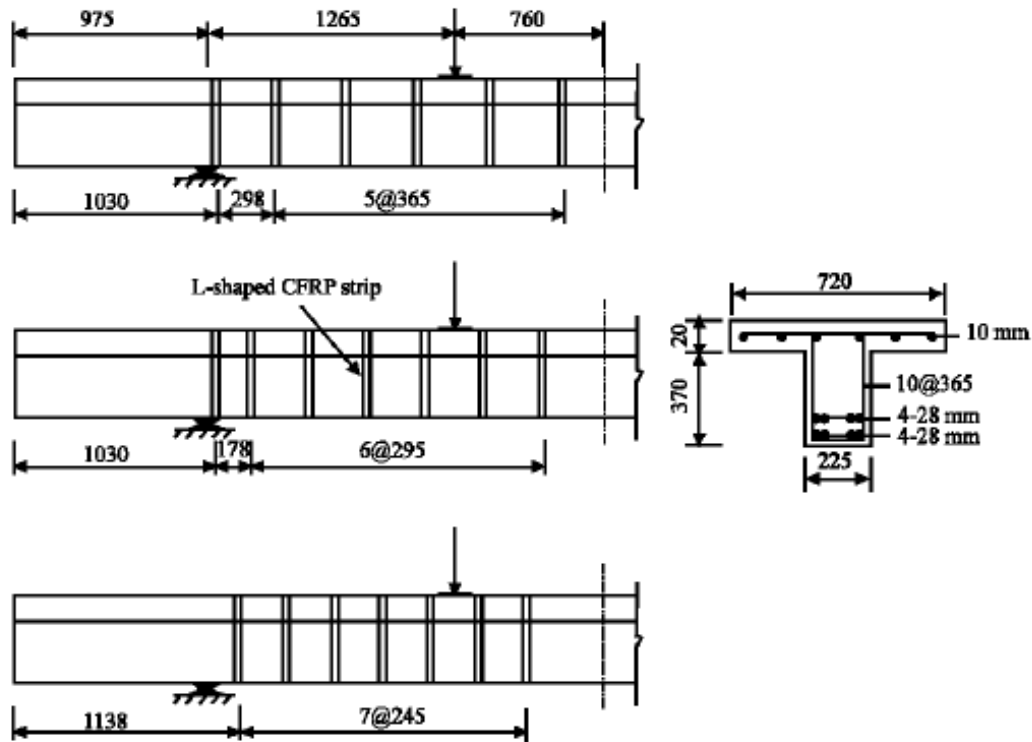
Details of Lee and Al-Mahaidi (2003) T-beams
